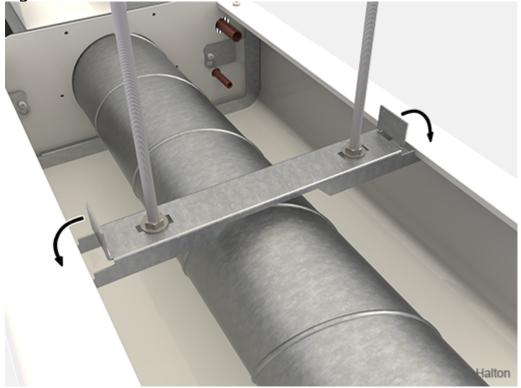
Duct cover fixation with threaded rods from ceiling. After the ceiling bracket is on its place the cover plate can be locked to the right position by bending the fixing part as shown above (arrows).
